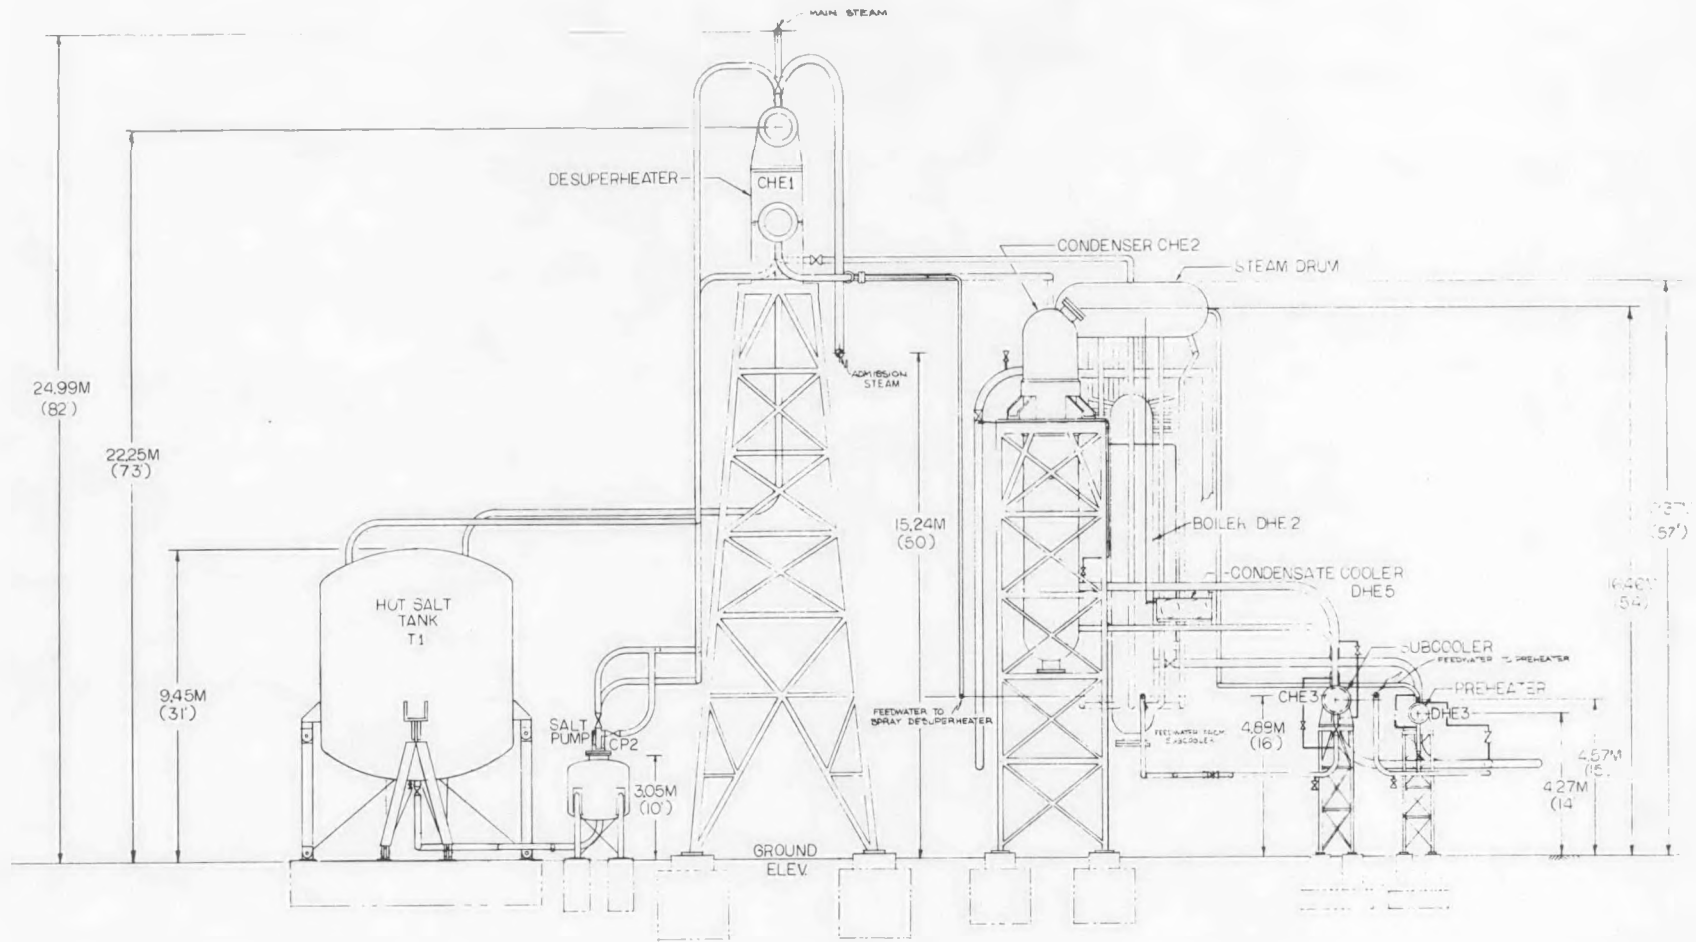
Pilot Plant Thermal Storage Subsystem Layout
